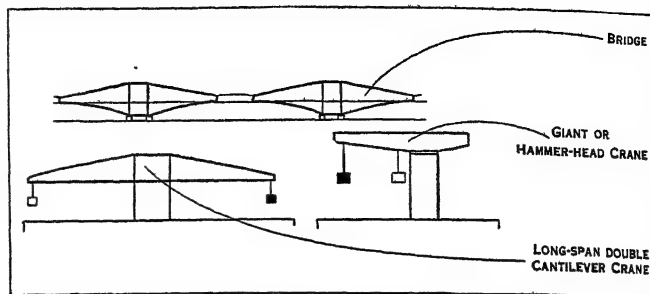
THE CANTILEVER IN BRIDGE BUILDING AND IN CRANES
